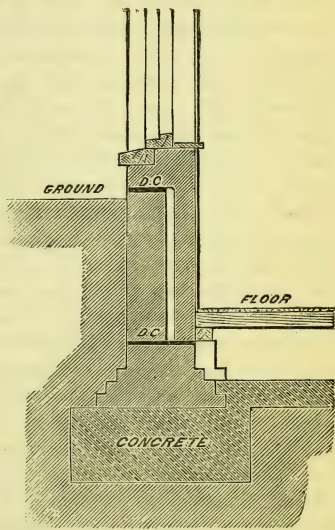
Double damp-course. Soil abutting upon hollow wall.
